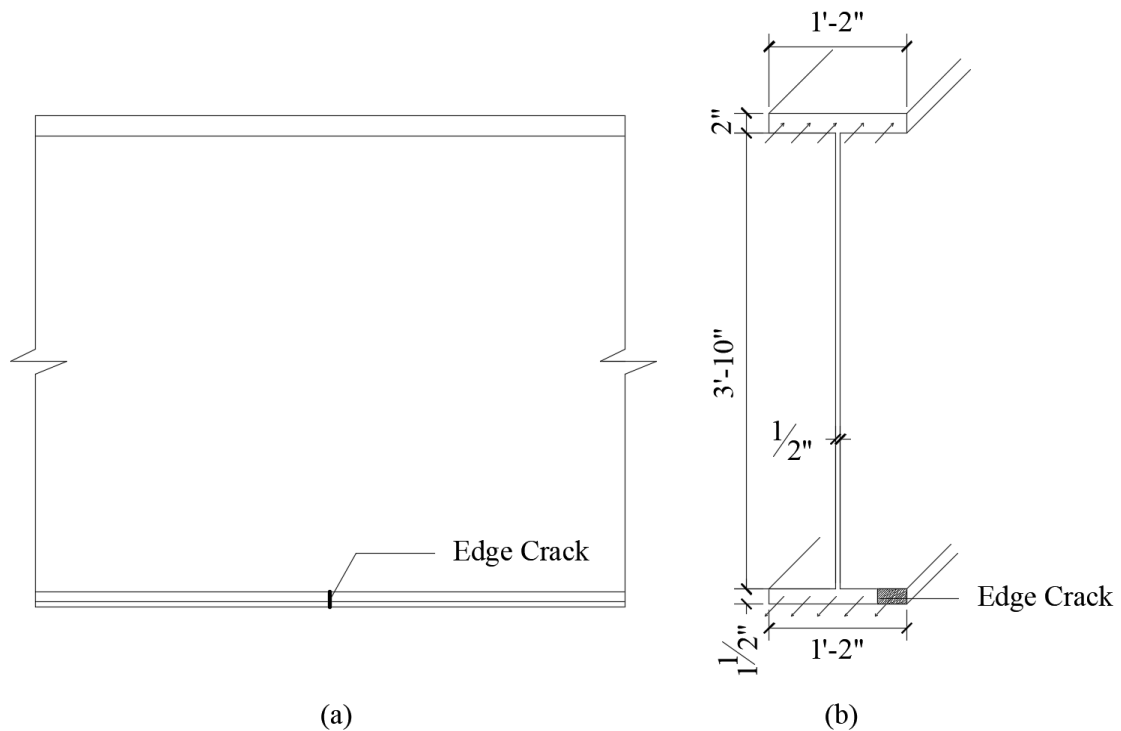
(a) Elevation and (b) Cross-sectional View of an Edge Crack Configuration in an I-shaped member
